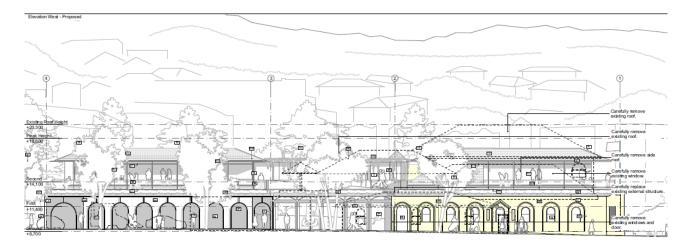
Existing west elevation – proposed demolition. Source: Lockhart-Krause Architects, 2021
